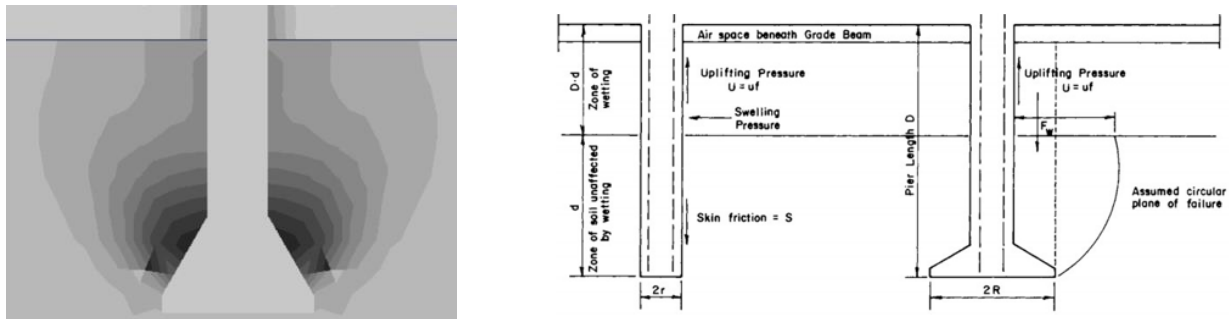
Failure Plane observed in the FEM (left) and Failure Plane Assumed by [4] (right).
